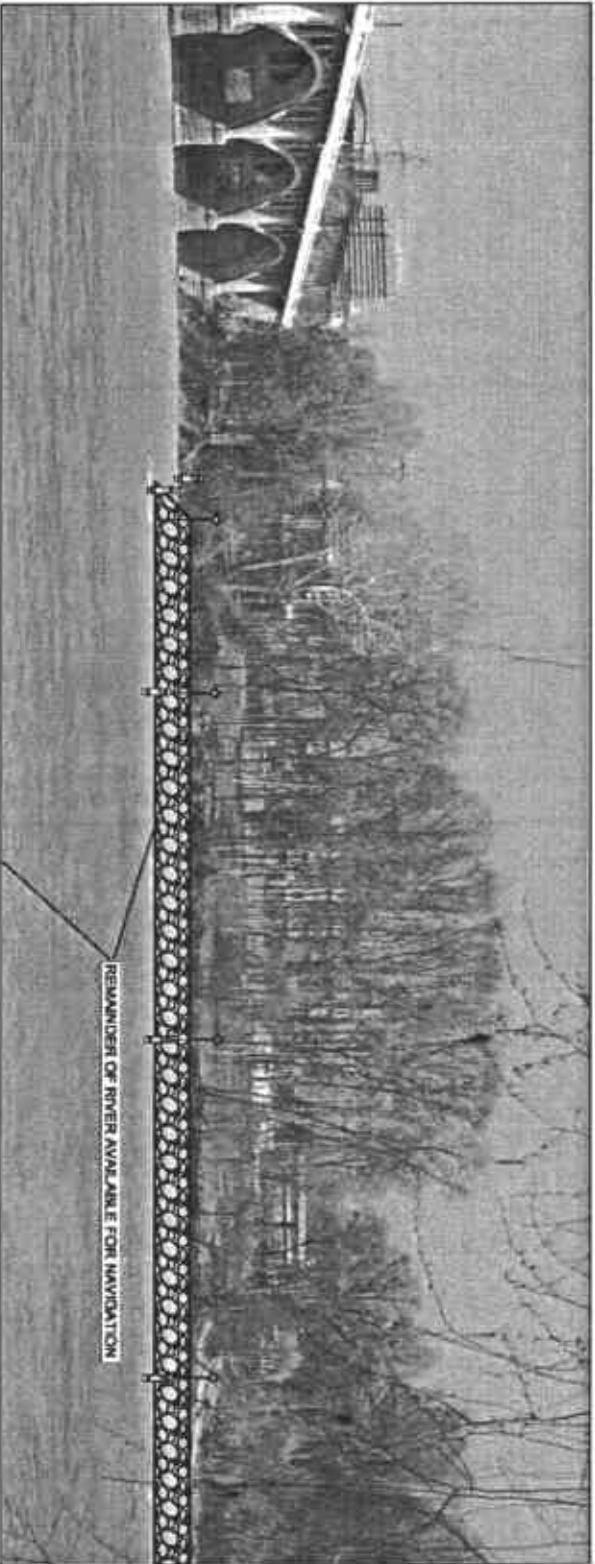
Conceptual construction plan for proposed access roads and improvements.
